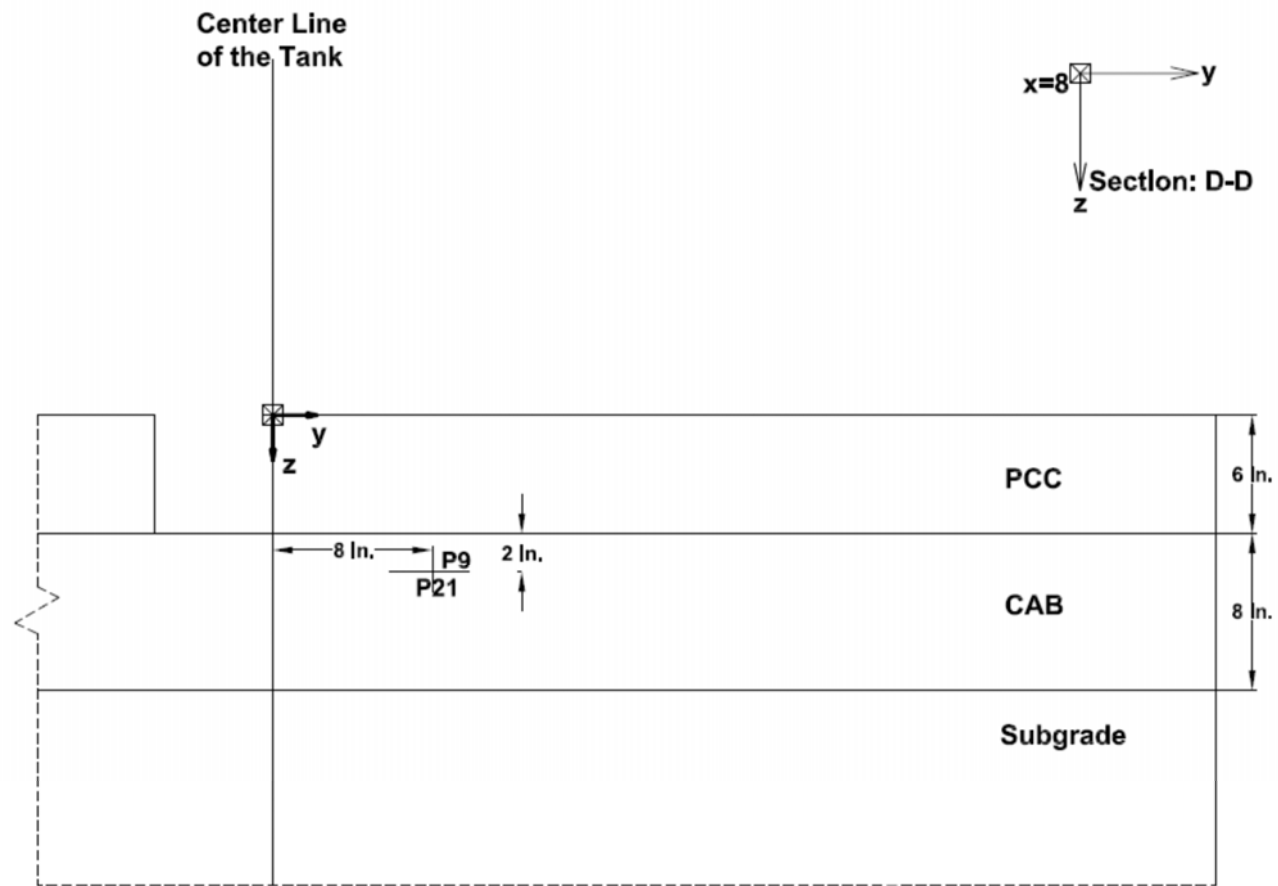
Instrumentation plan for experiment No. 10—Profile view, X=8 inches
